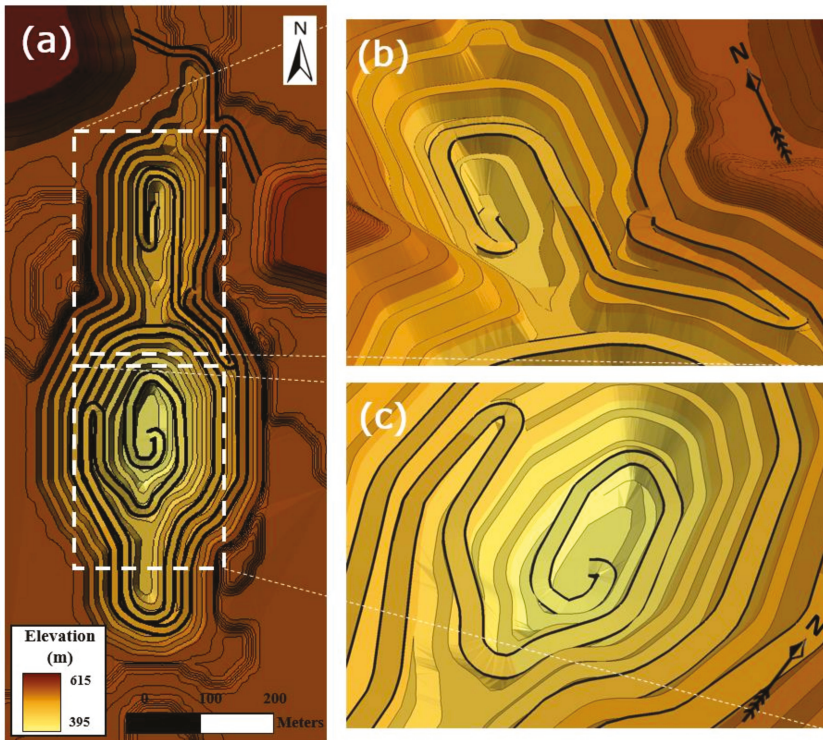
Result of the haul road design. (a) Open-pit mine with bench and haul road. 3D views: (b) pit 2 area and (c) pit 1 area [23].
